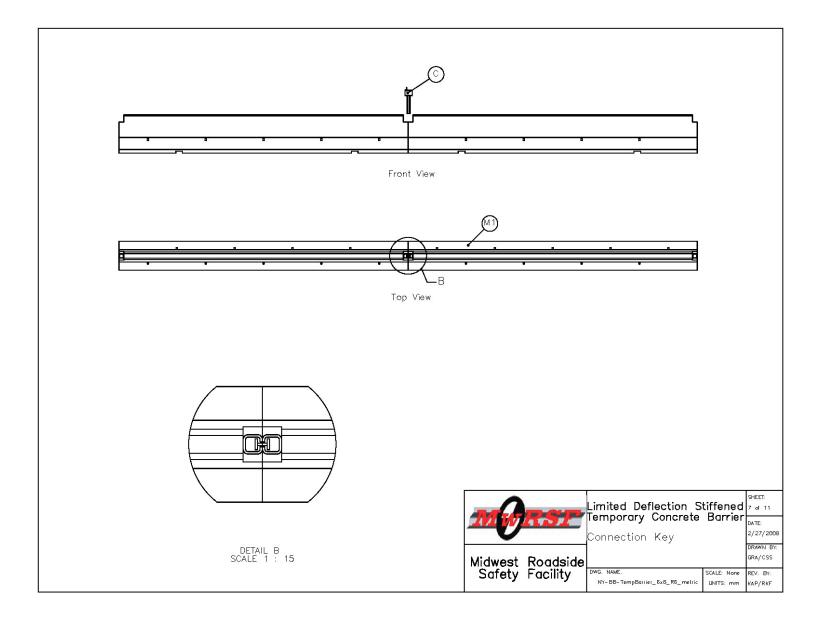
Temporary Concrete Barrier Connection Details, Test NYTCB-3
